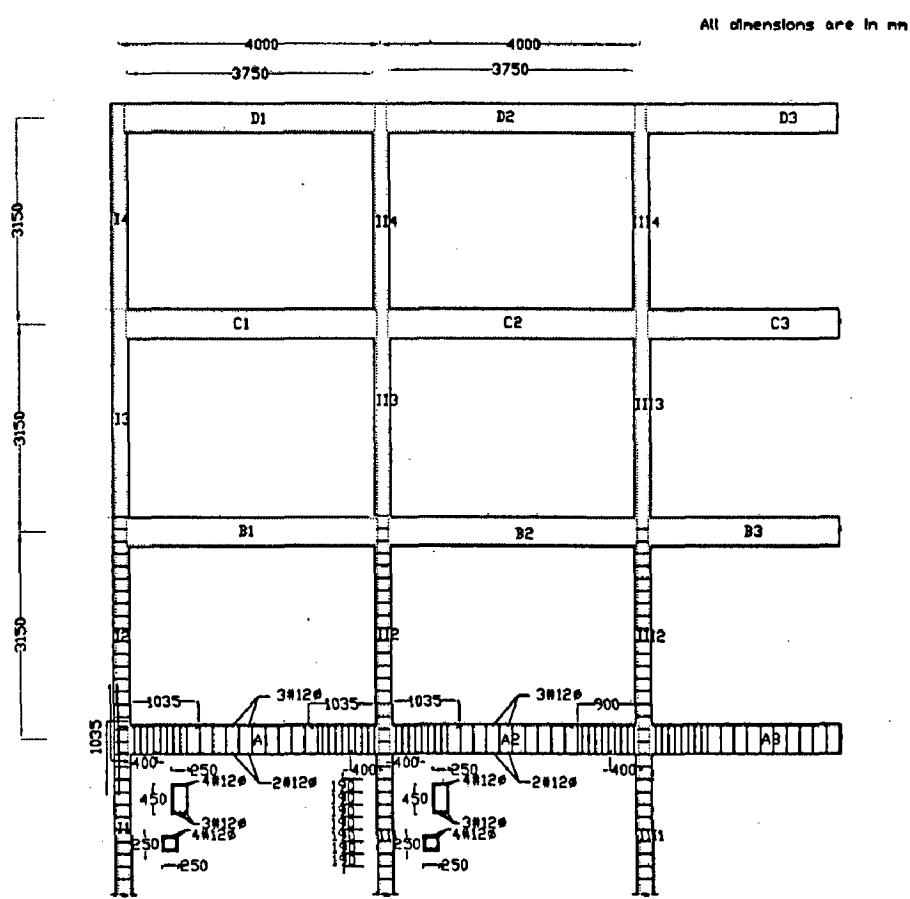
Details of beam and column reinforcement of exterior frame for static case
